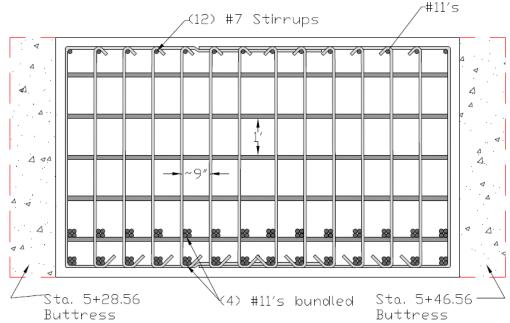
Typical reinforcing steel layout. Deer Creek Dam Spillway Modification.
